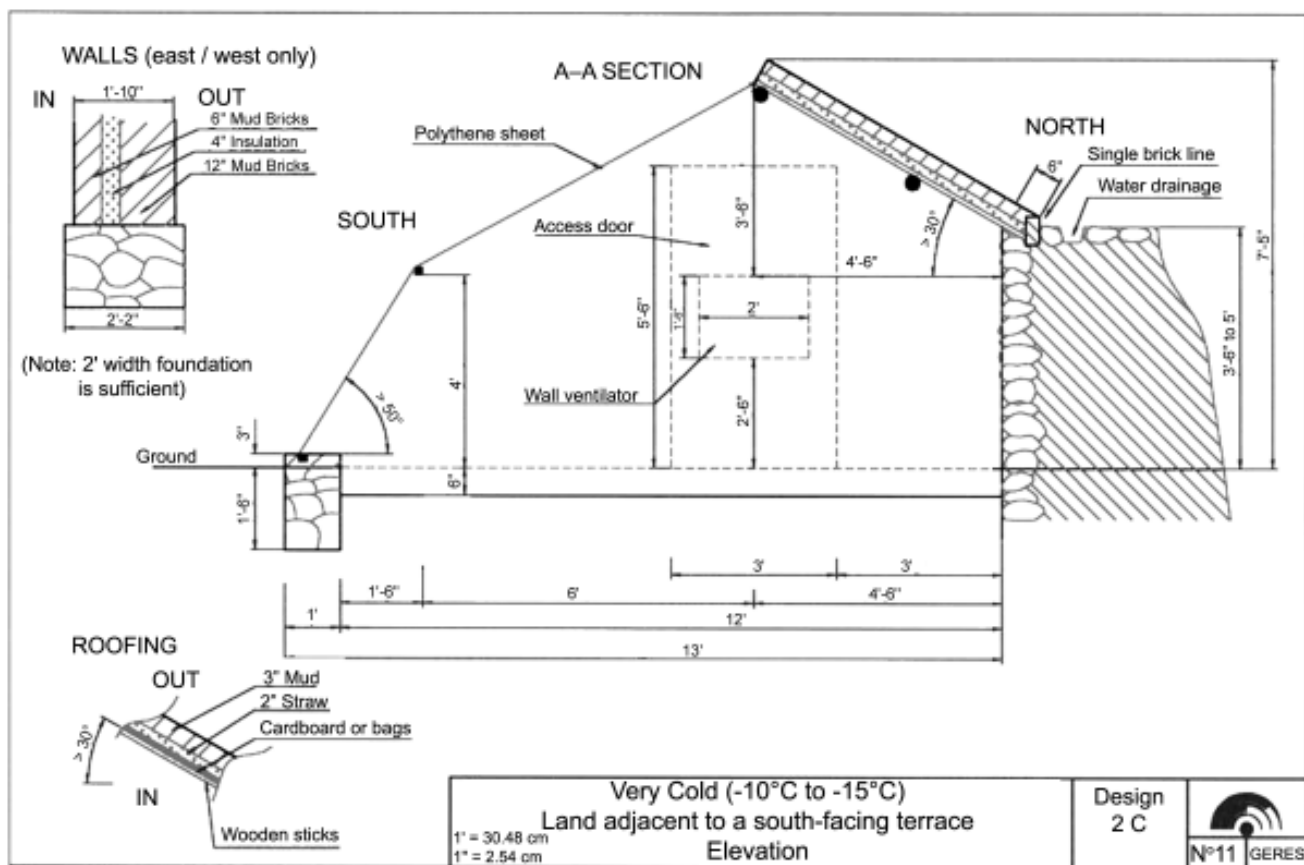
Design 2C - Greenhouse for very cold climate, site adjacent to a south-facing terrace wall
